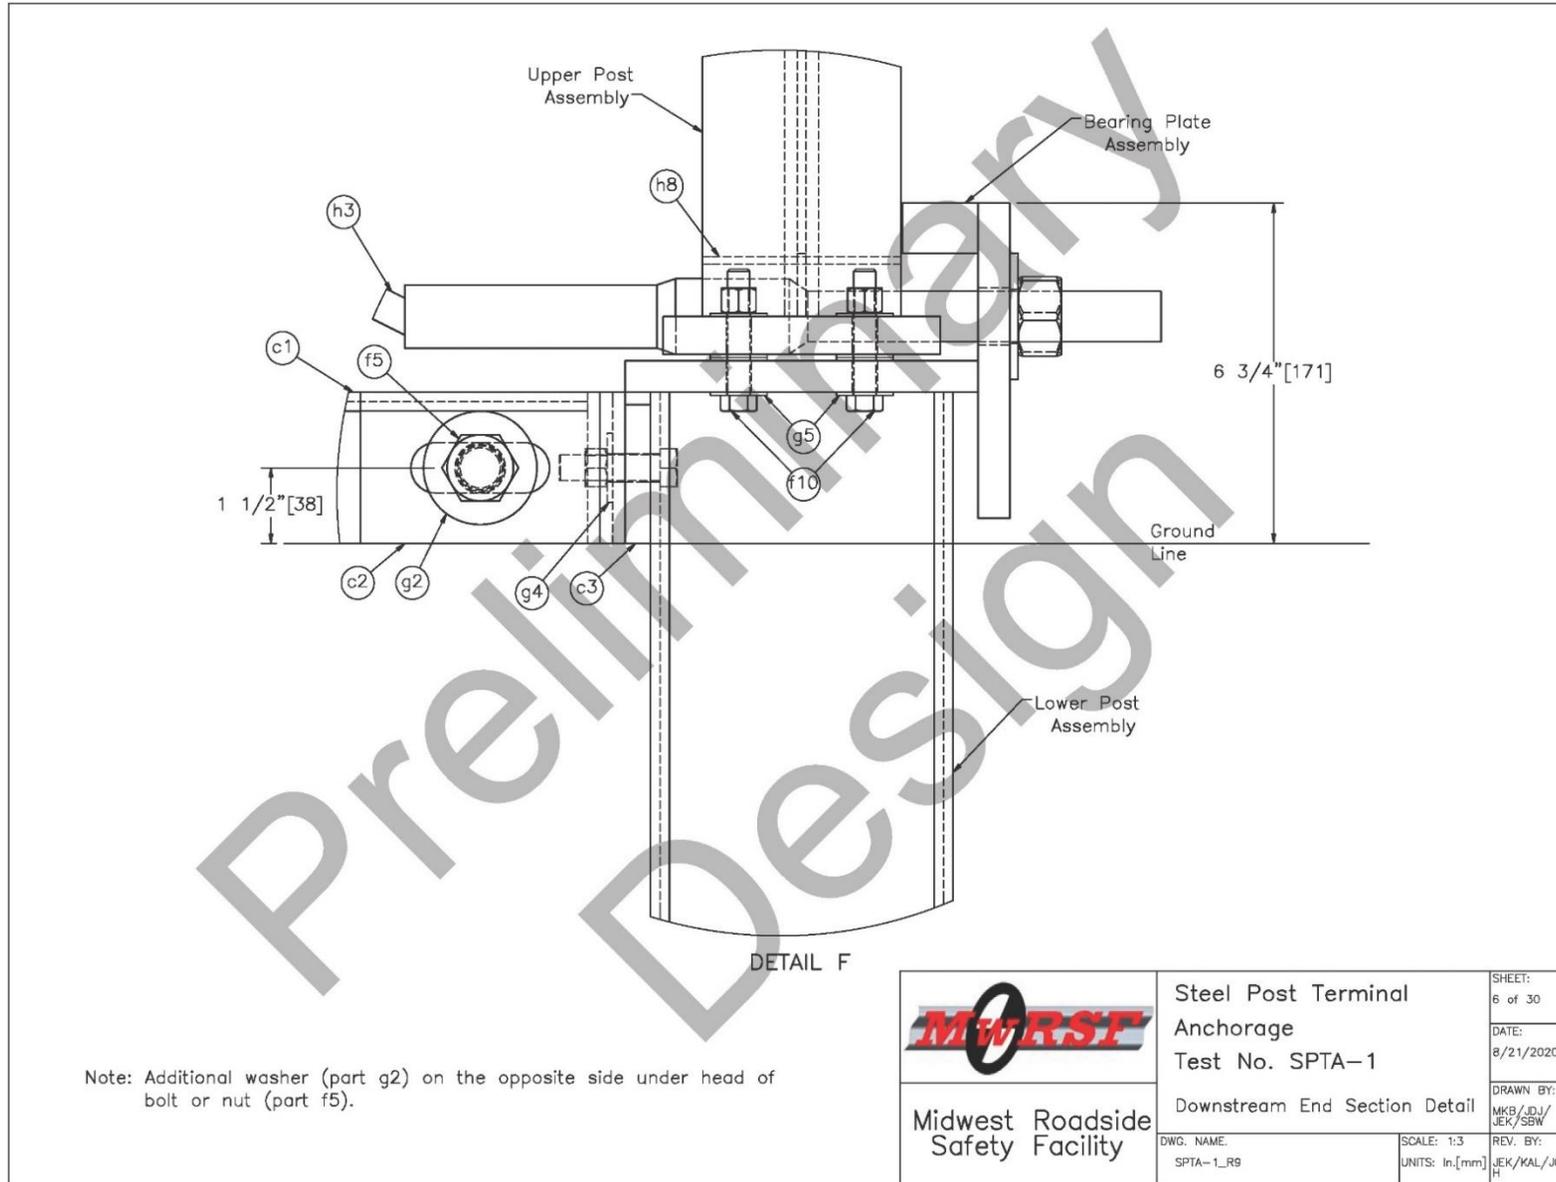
Downstream End Section Detail, Test No. SPTA-1
